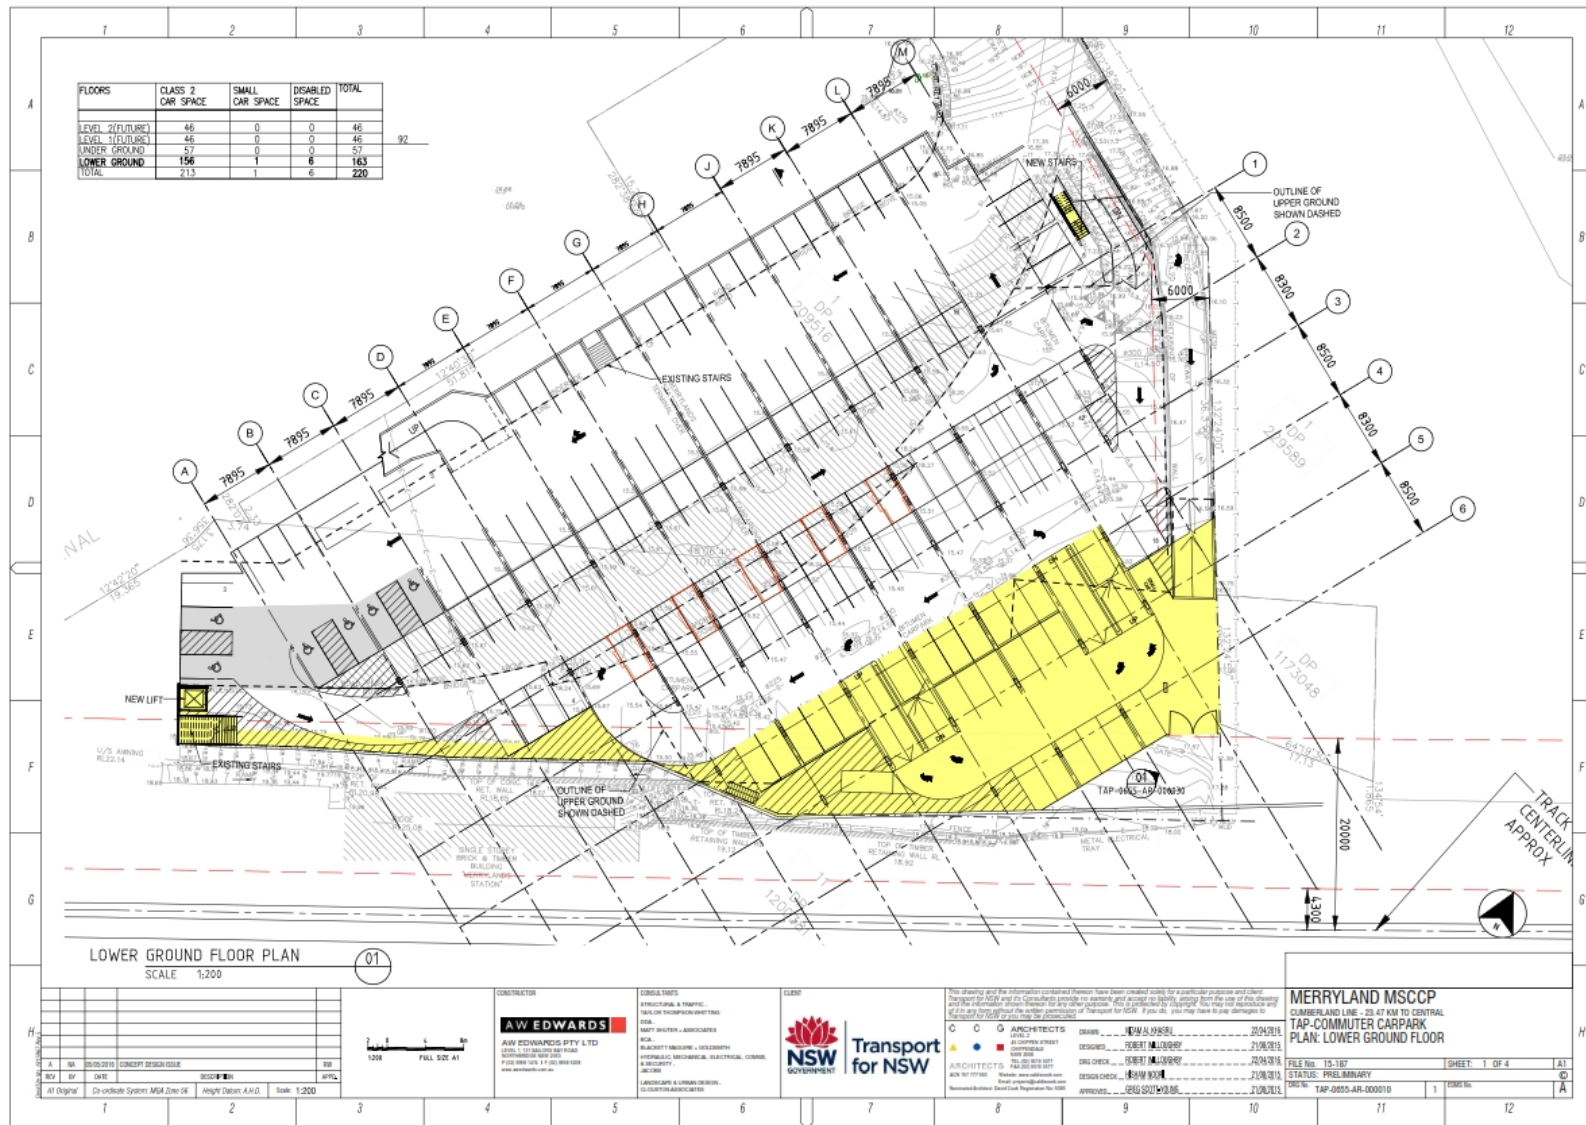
Proposed ground floor plan of Site 1 car park (Source: TfNSW)
